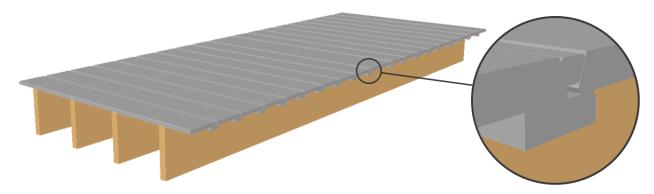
A model of the bridge with detail of the connection shown specifically.
